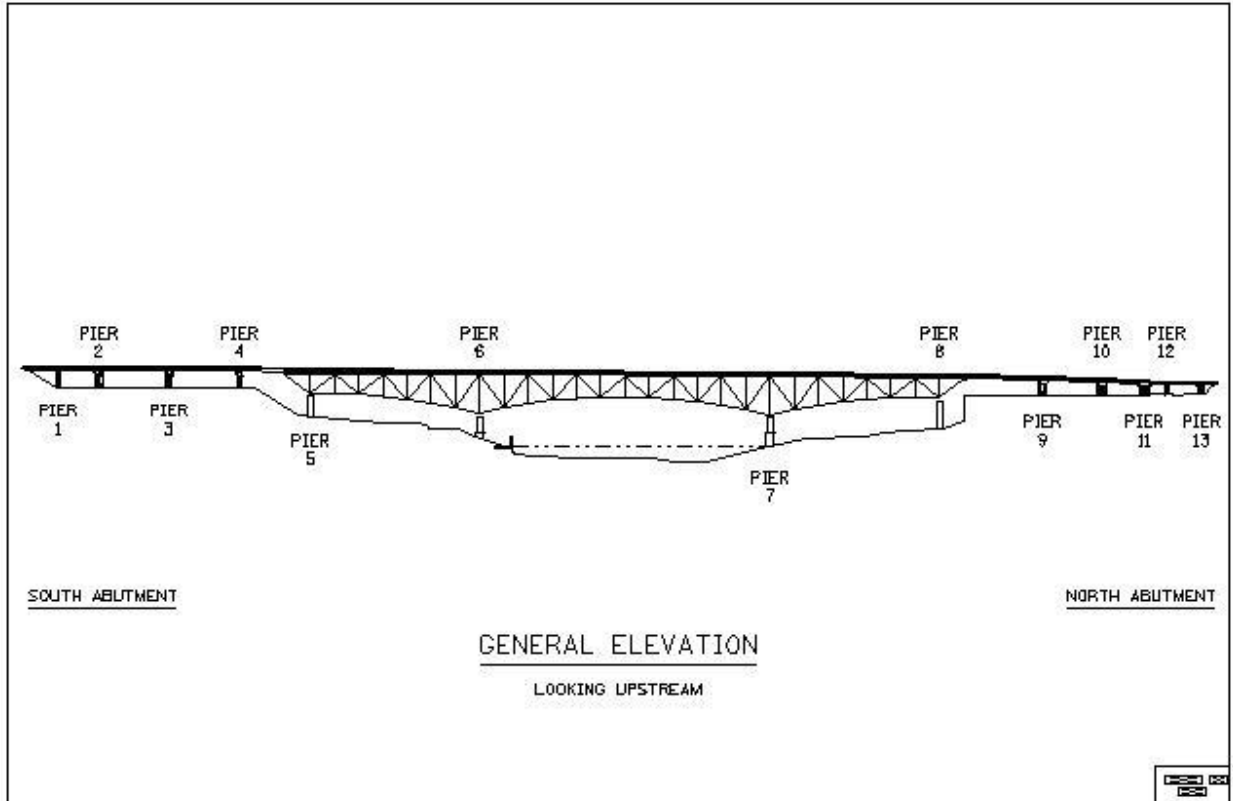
Elevation of entire length of bridge from south abutment to north abutment
